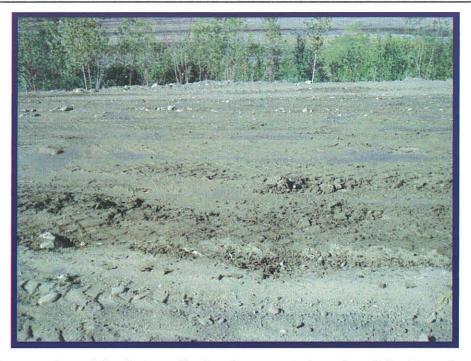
shows a view of the first scarified and compacted section of the Rose Creek Diversion Canal Dike, looking to the north from station 1+000. Note the application of water.
